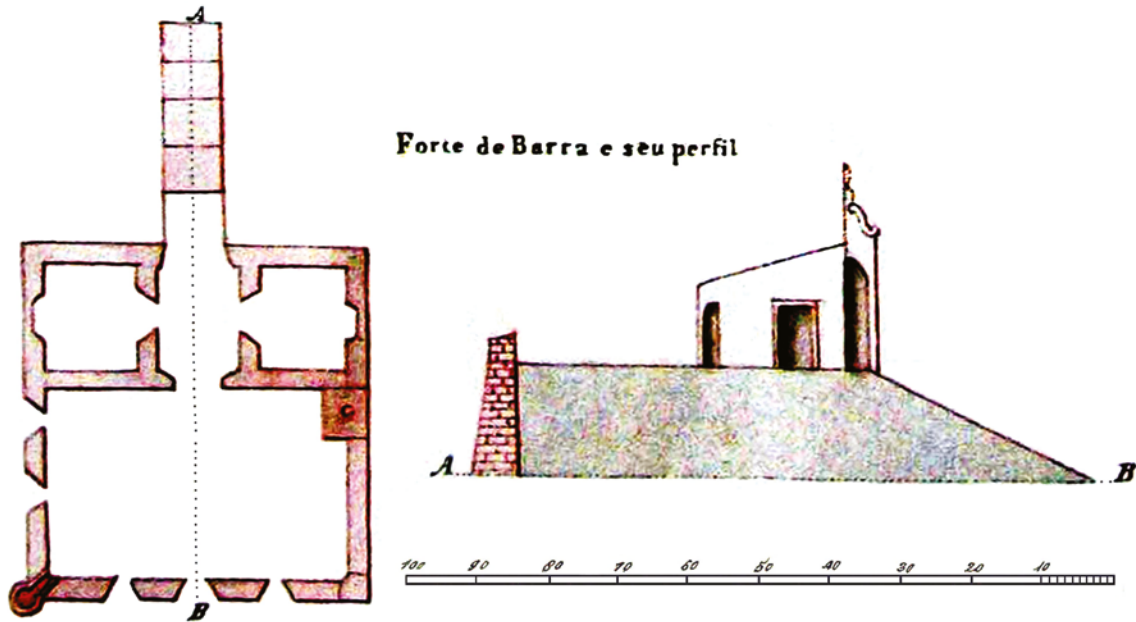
Forte de Barra* (Fort of the Bar), plan and section A–B. As with other drawings in the 1856 Map the plans are fairly accurate, but not the sections, which do not show all parts of the wall running around the yard.
